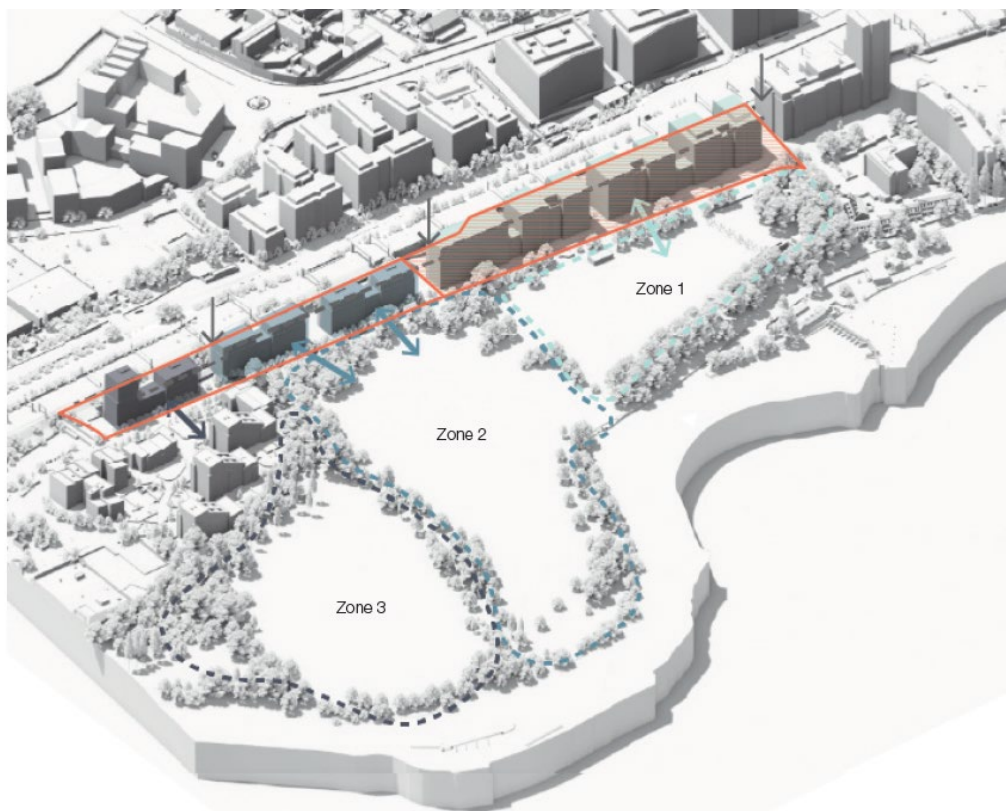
Applicants indicative masterplan for the CR11i site allocation area
